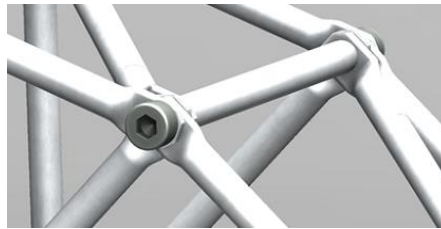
Joint showing the linking of bar elements in parallel and perpendicular planes.
